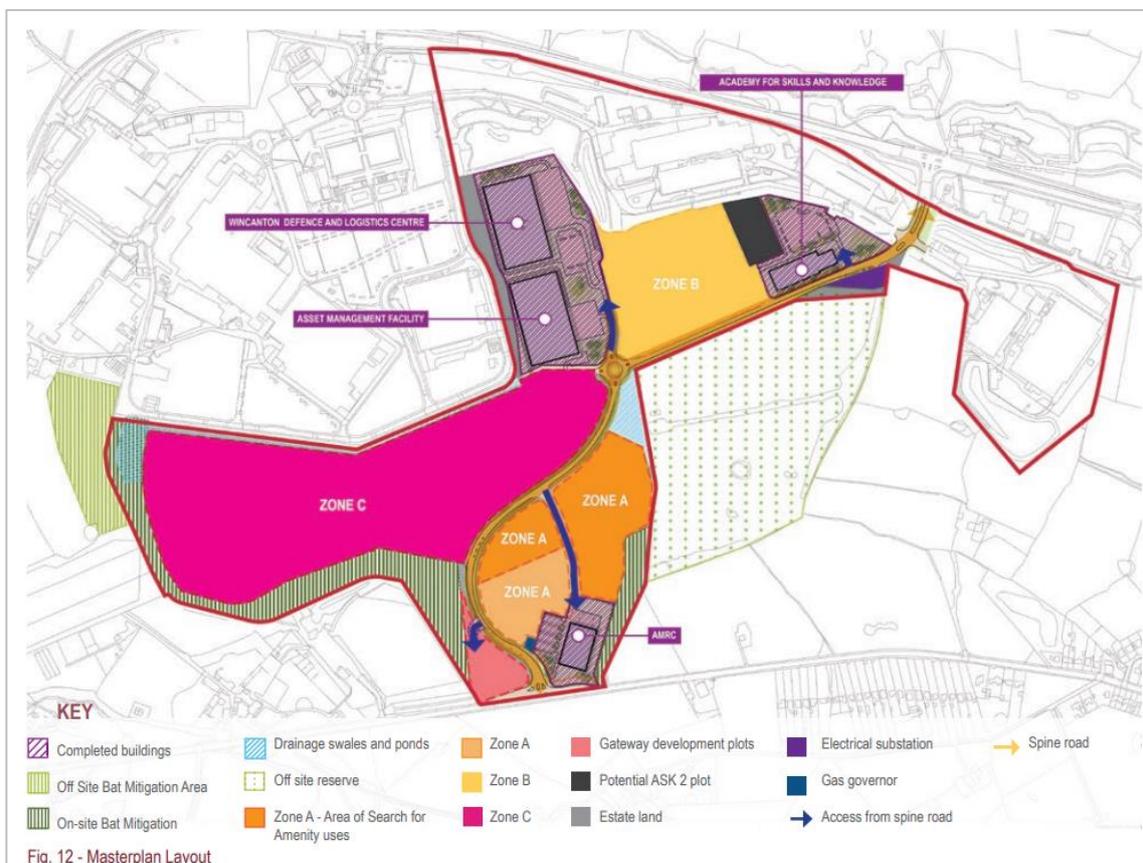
Masterplan Layout (Source: SEZ Masterplan 2024)
